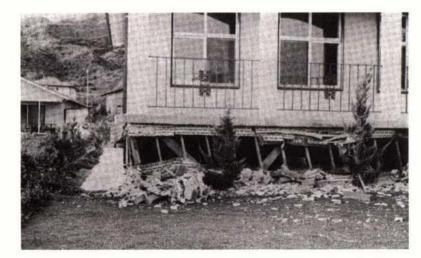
Jackstudded Sub-floor showing Cladding broken off and a slumping to one side (Source: Jennings and Housner 1971)
